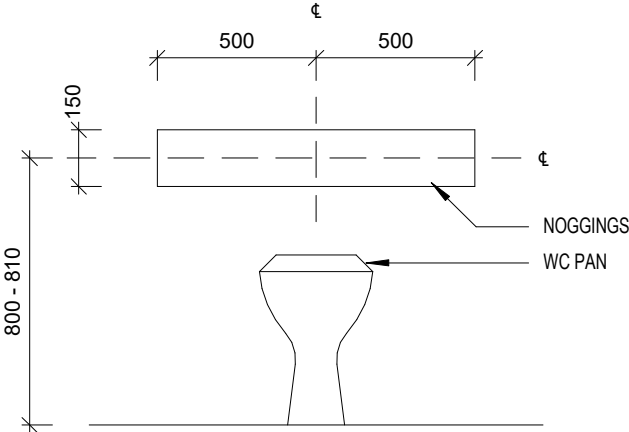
F - LOCATION OF NOGGINGS FOR A WALL BEHIND A TOILET PAN
